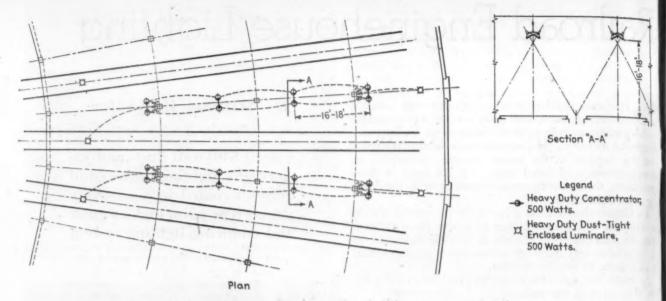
Typical lighting layout for enginehouse stall-Units are tilted to center light beam on work area
